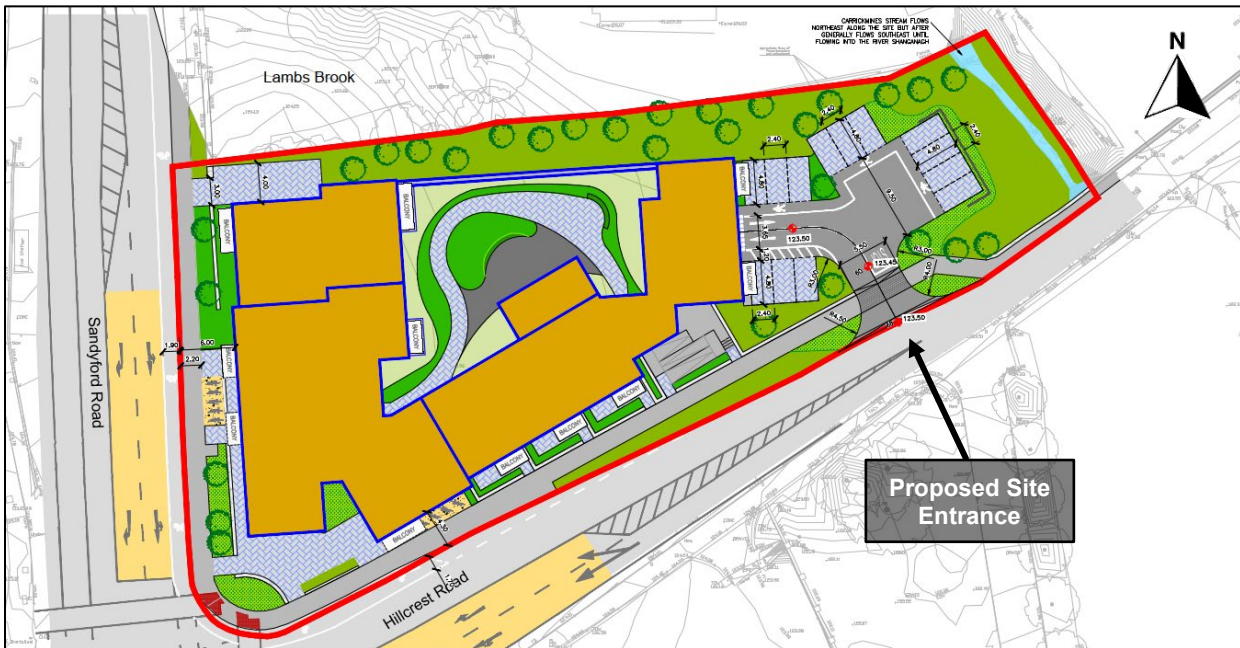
Site Plan (Cropped) (A refinement of this site layout may be circulated by the architect)
